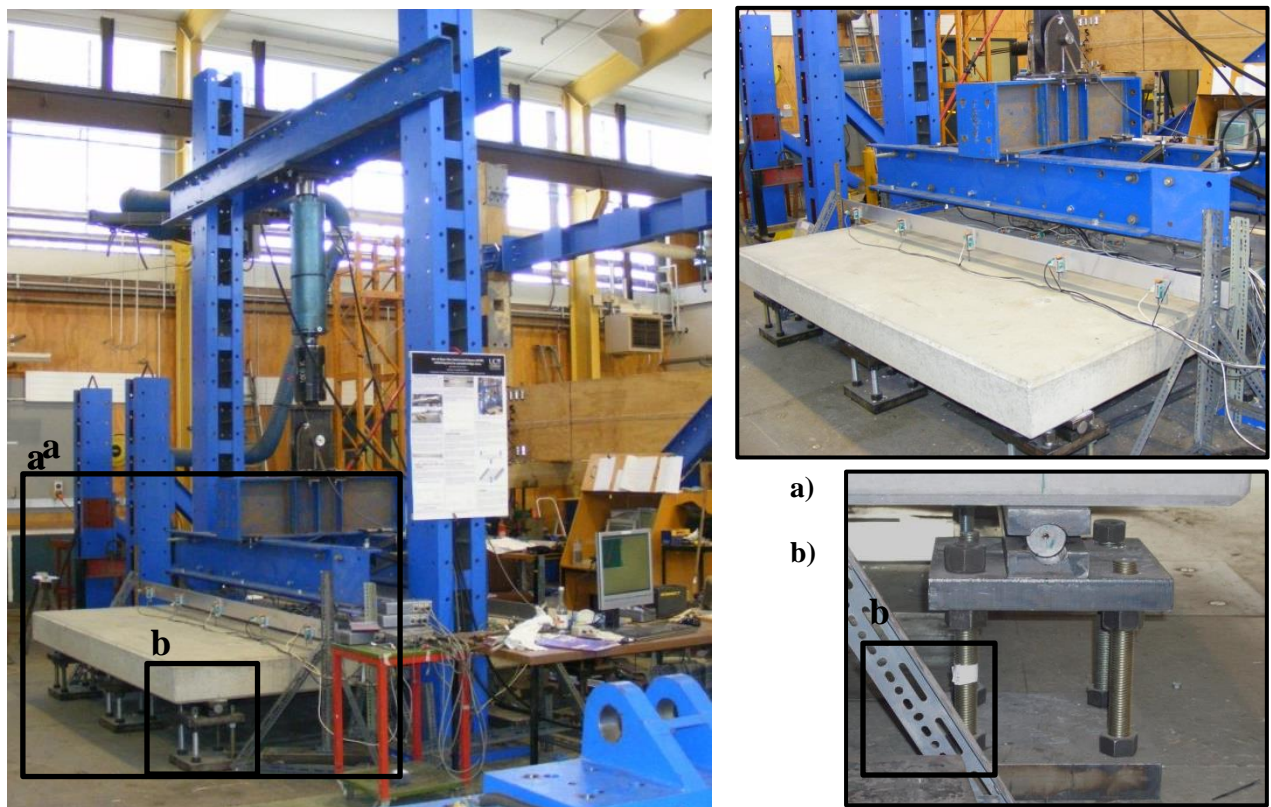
Left: Overall photo of bending test set-up. Right: a) Slab specimen with surrounding load frame and instrumentation. b) Close up photo of single support with pinned joint.
